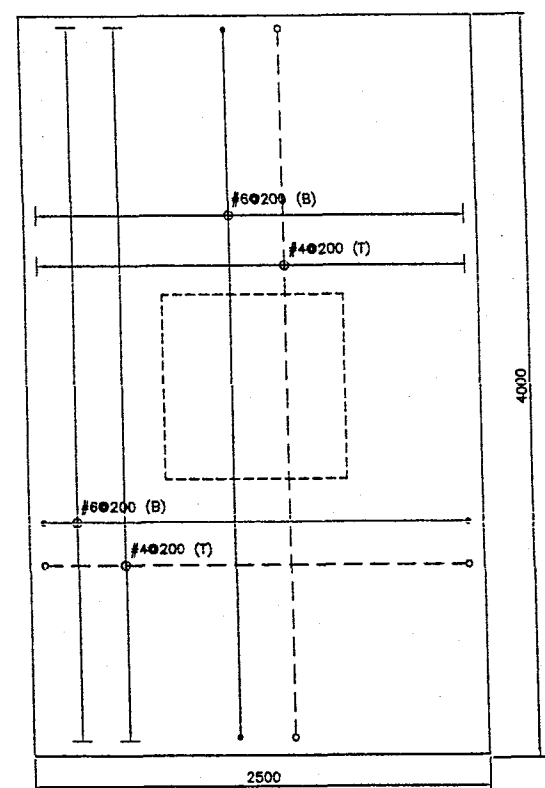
DETAIL 'D' (SIGN PLATE NOT SHOWN)
